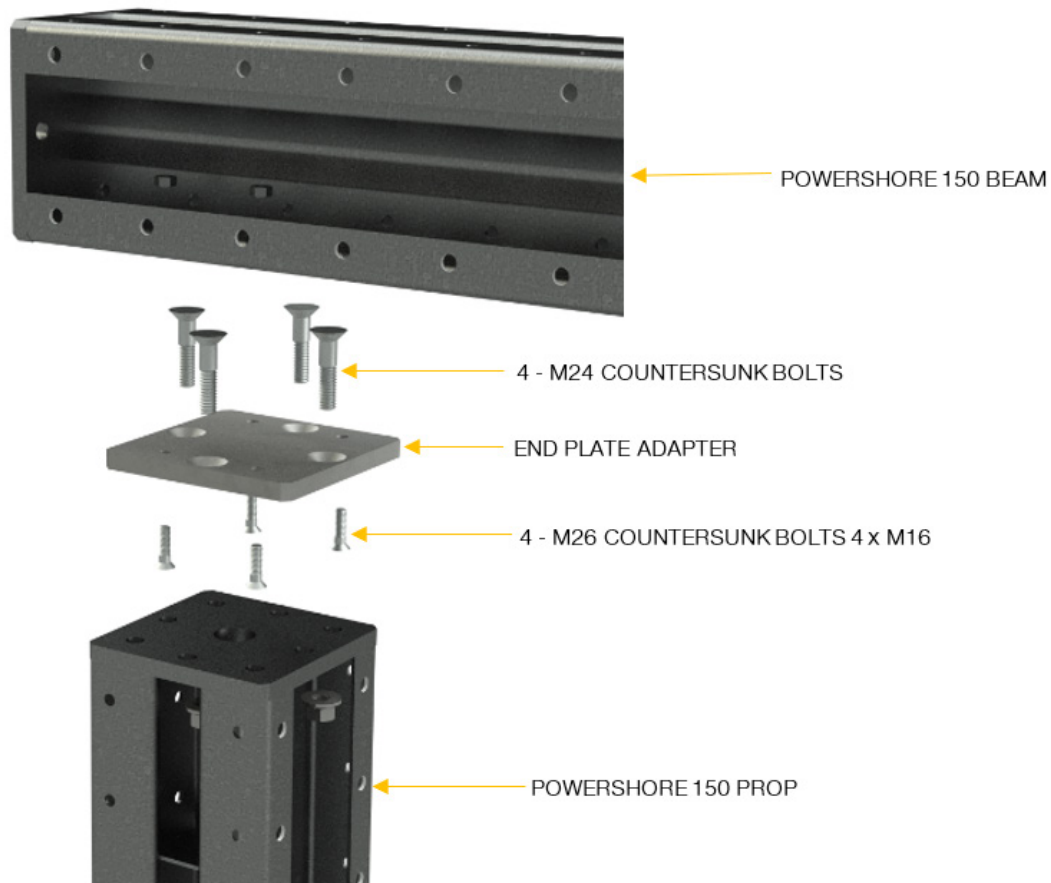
DETAILED VIEW OF BOLT CONNECTION TO POWERSHORE 150 PROP FLANGE
